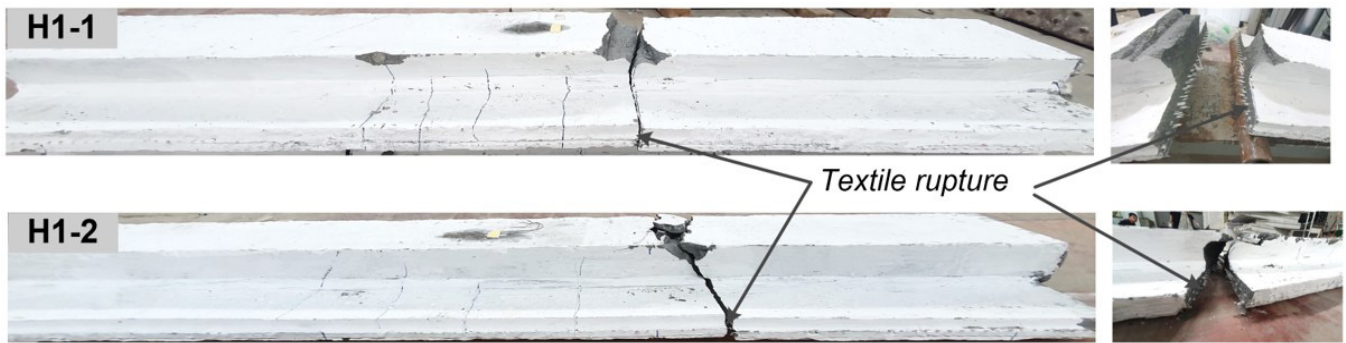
The failure mode of TRC formwork specimens H1-1 and H1-2
